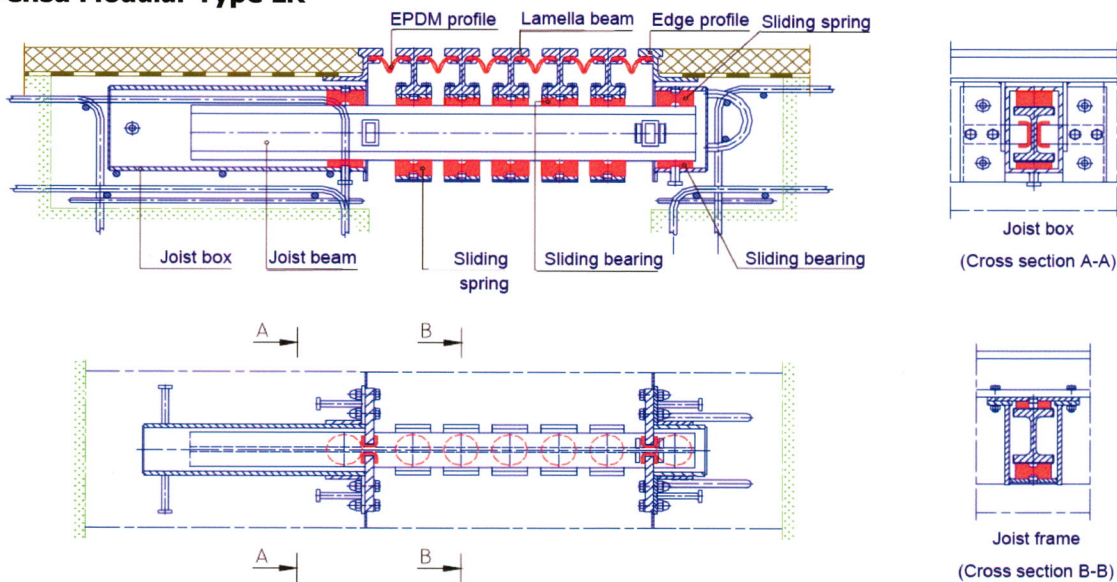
Different cross sections of the support bar and the connection between the support bar and centre beam of a Mageba LR joint.
